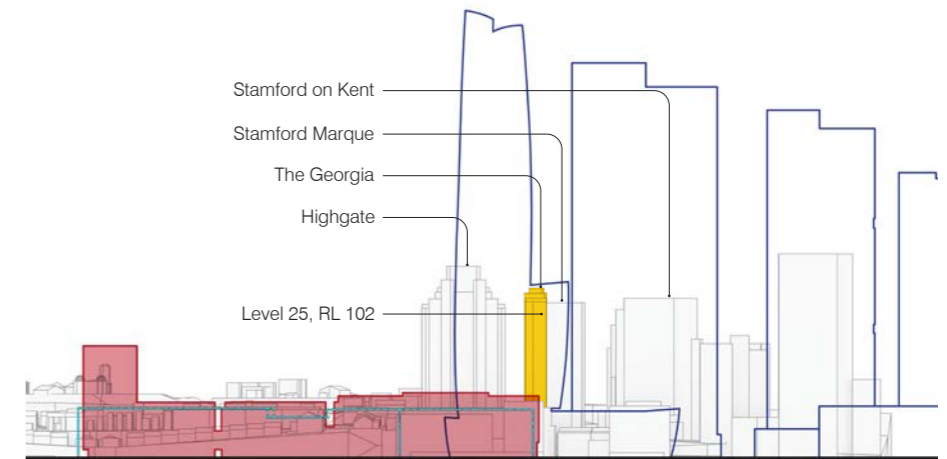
Elevation Looking East - MOD 9 with the Approved Concept Plan shown in light blue outline (Source: Modified from HASSELL diagrams (November 2018))
